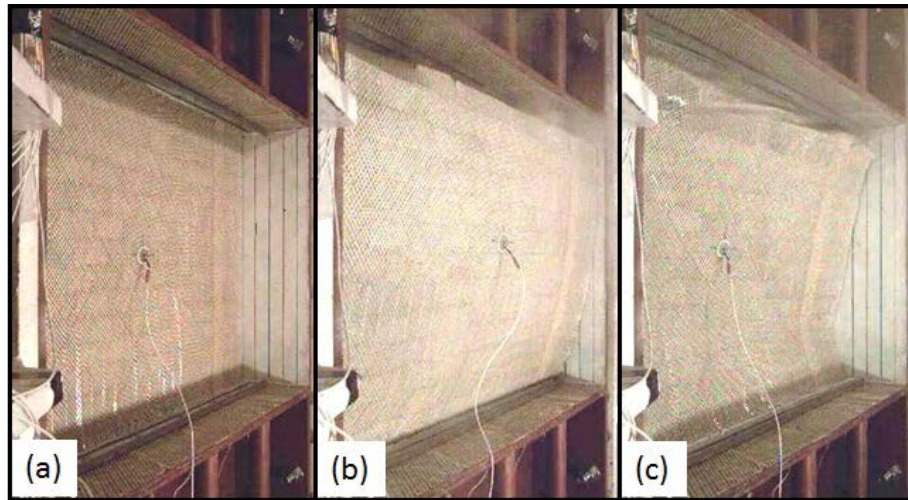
BLS8: Frames from high-speed video. (a) Camera view before airblast arrives. (b) Maximum deflection at top support. (c) Final wall position.
